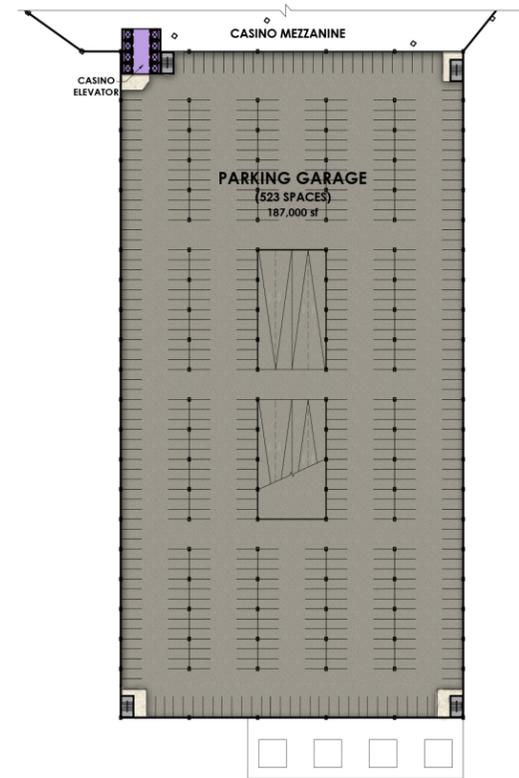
a.7-1 Plans for Parking Structures
